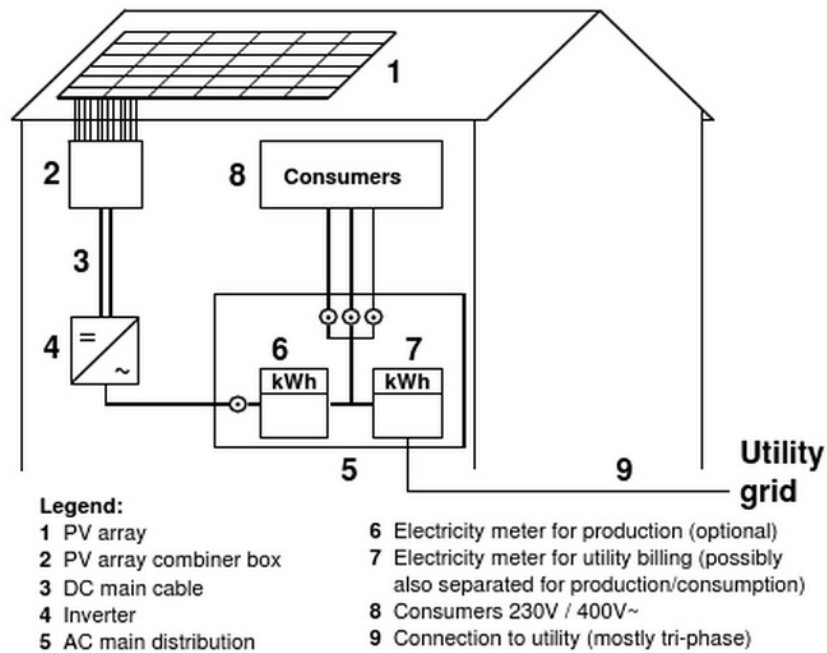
Layout of a typical PV system mounted on a building. [4]
